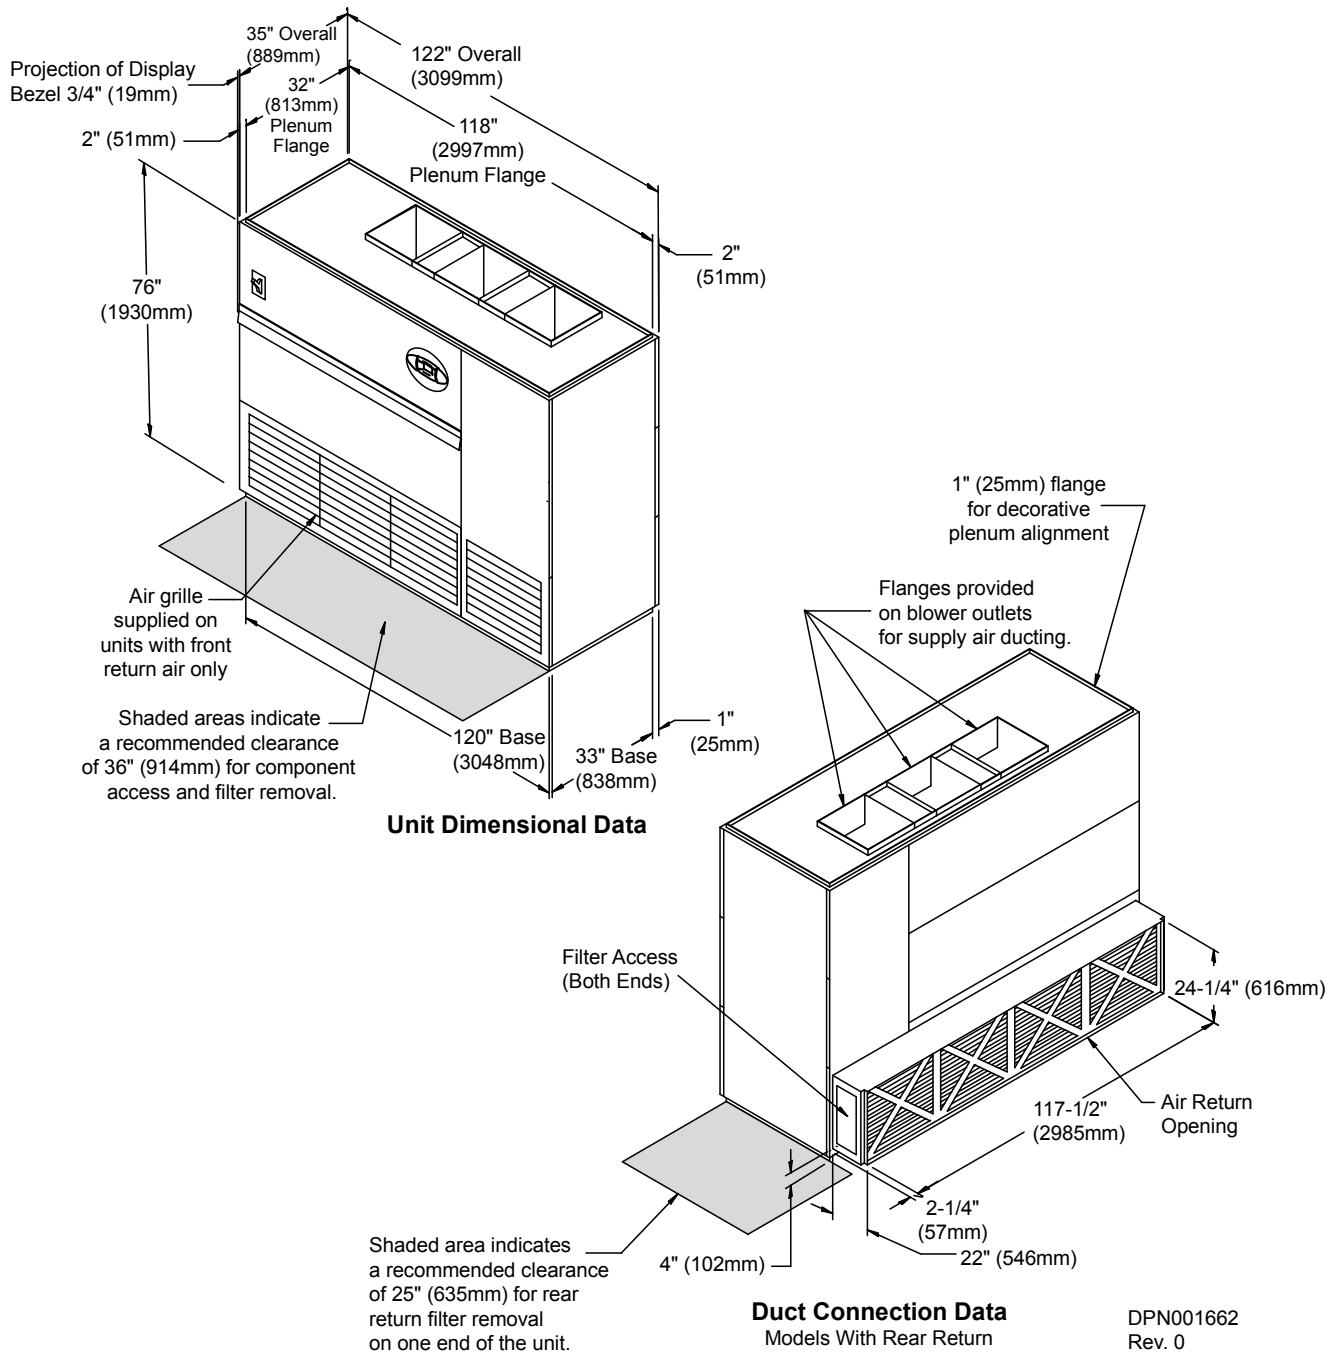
Cabinet and floor planning dimensions, upflow models—CW026-CW084
